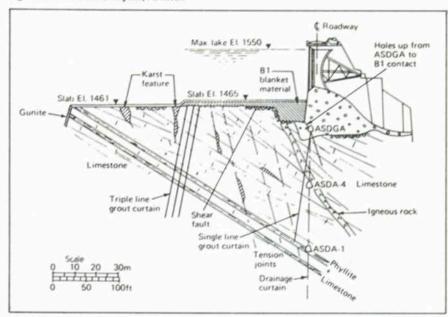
, General Cross Section of Auxiliary Spillway upstream protective works, Tarbela Dam
